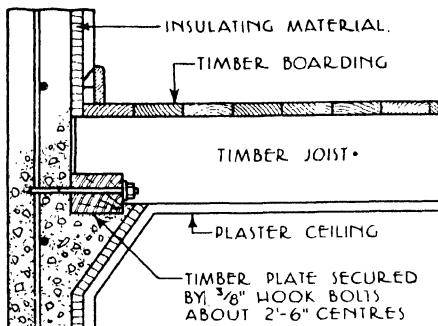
SOLID R.C. WALL WITH PROVISION FOR TIMBER FLOOR
